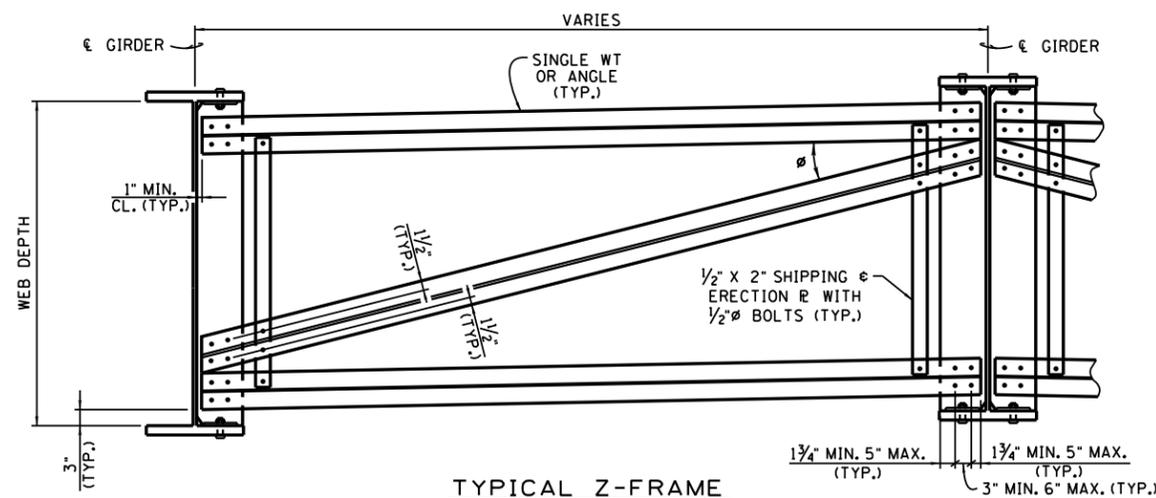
Standard Details for Cross-Frames and Lateral Bracing
